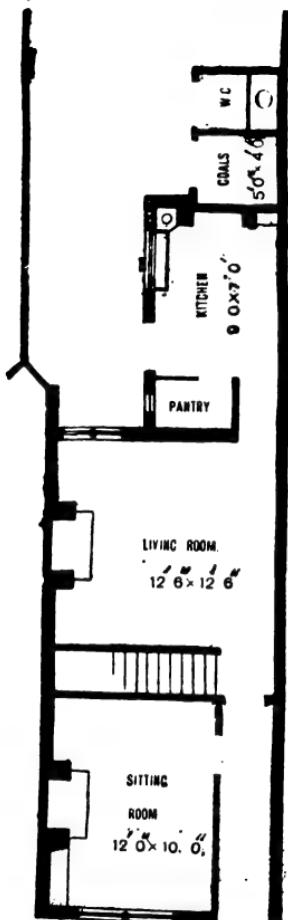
Ground Plan of 14-ft. 6-in. House.
